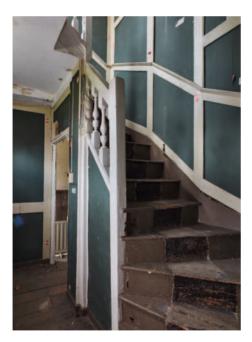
Tower Green No. 5, staircase balustrade. (Historic Royal Palaces)
